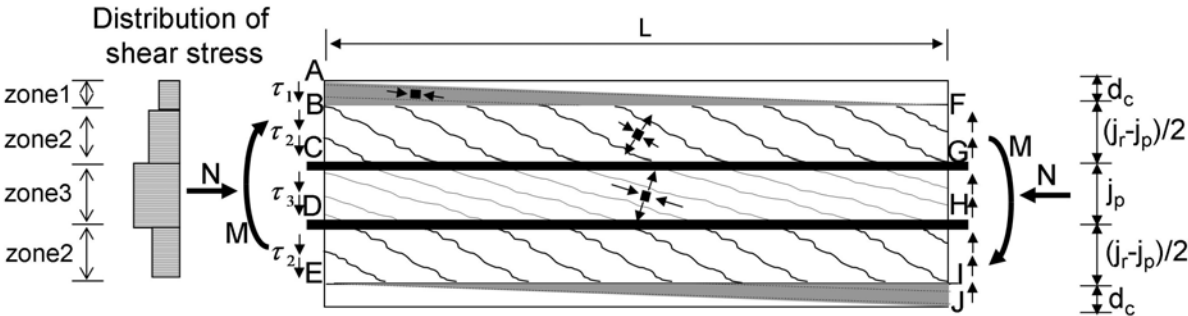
Proposed model for shear resistance mechanism of post-tensioned precast concrete member
